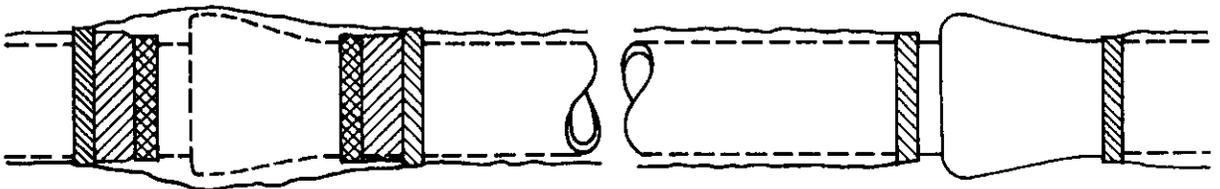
Method B: Separate pieces of polyethylene tube for barrel of pipe and for joints. Tube over joints overlaps tube encasing barrel.
